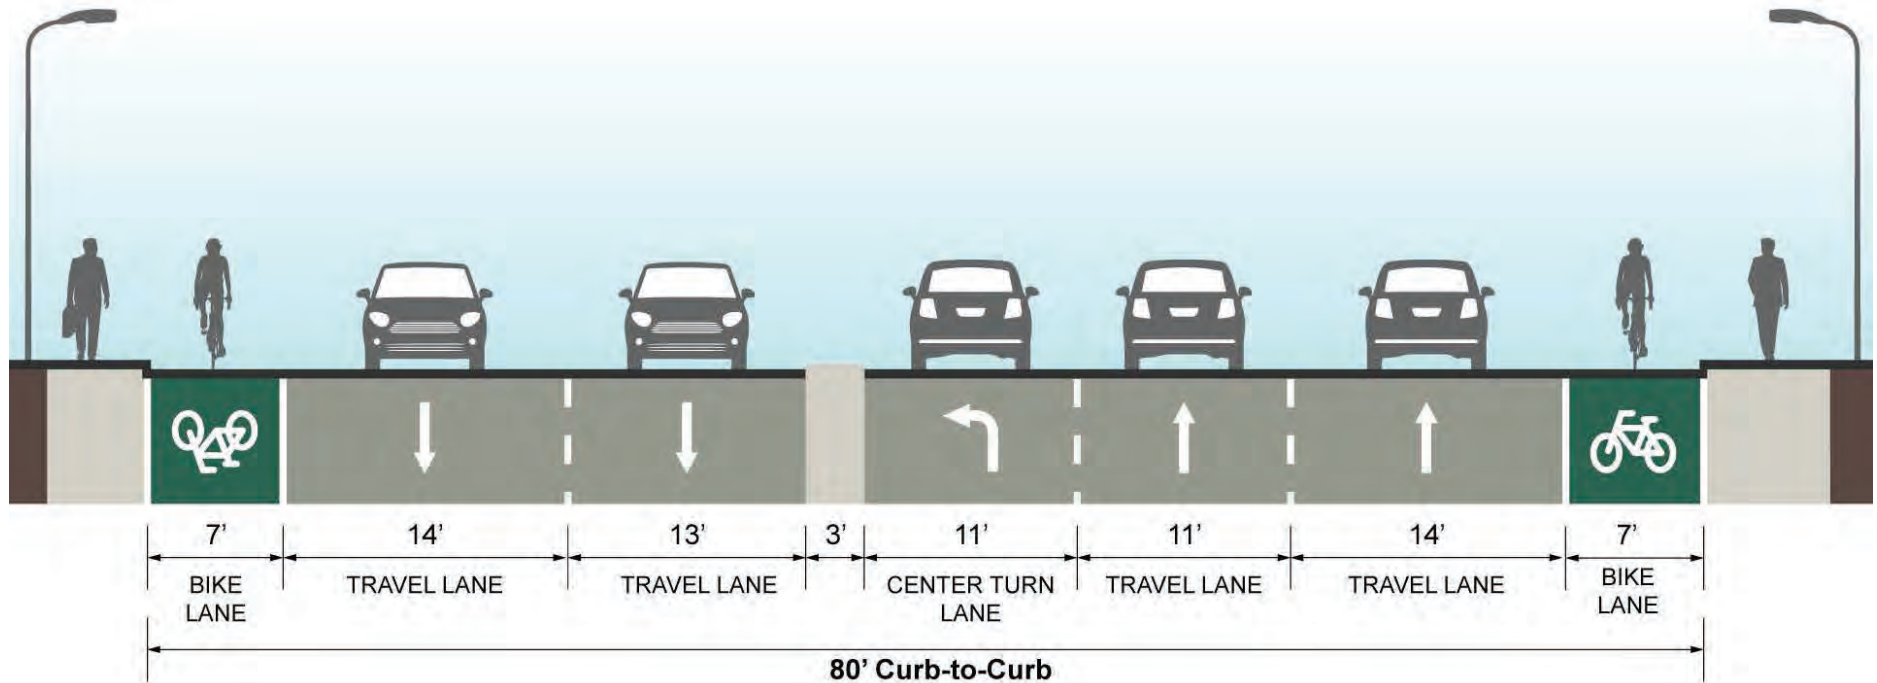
Existing Conditions/No Build Section 1 - Walsh Avenue (Bowers Avenue to Transition)
